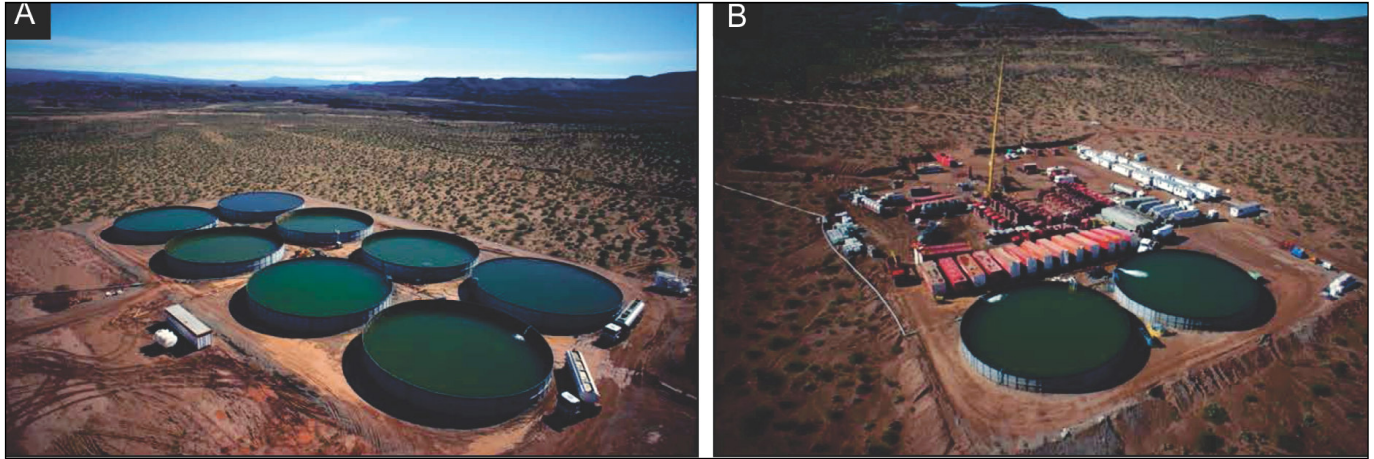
(A) Water location, circular tanks (16000 m³); (B) Horizontal well pad location, circular and fracture tanks (5500 m³).
